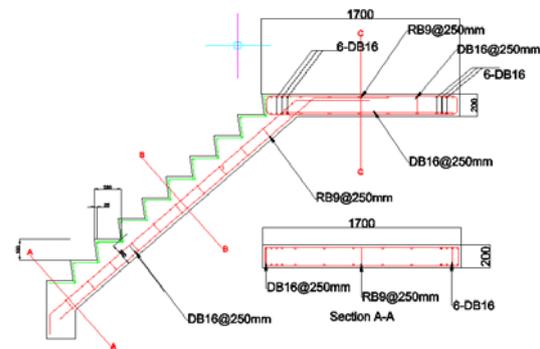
Generated Drawing of the Reinforced Concrete Stair
